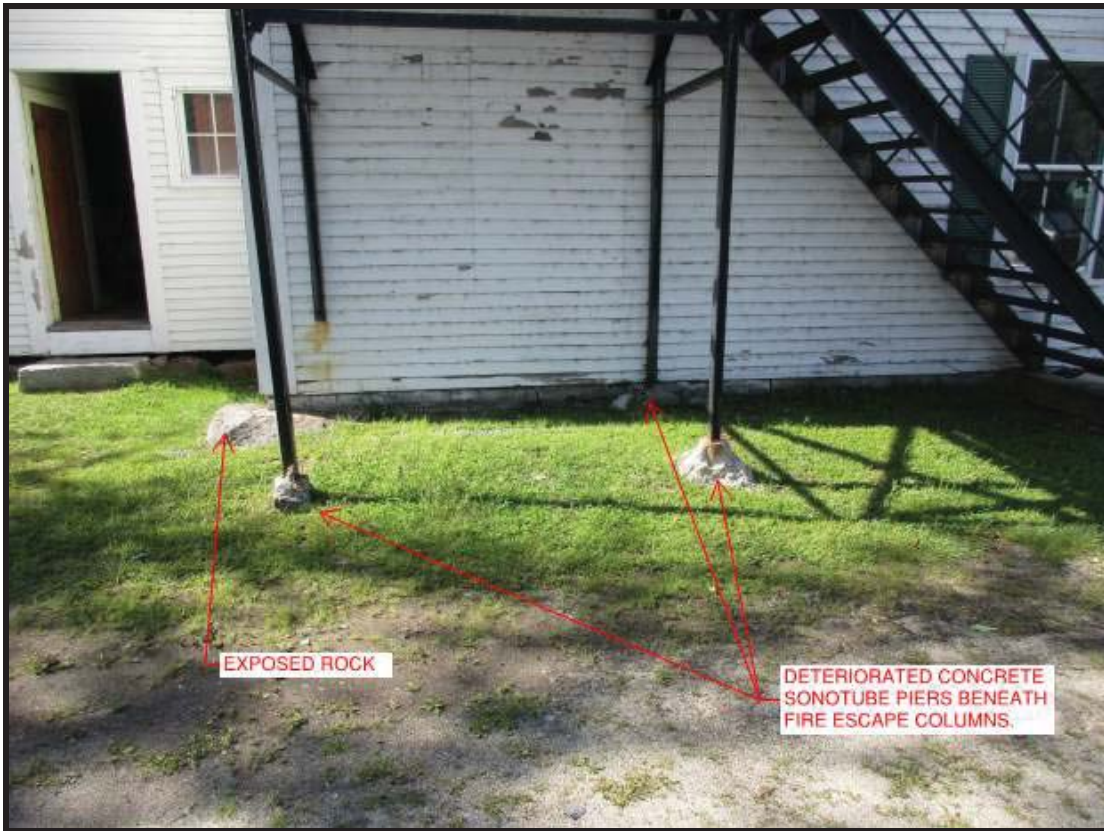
Partial view of west exterior wall, depicting deteriorated concrete sonotube piers and exposed rock adjacent to the foundation.
